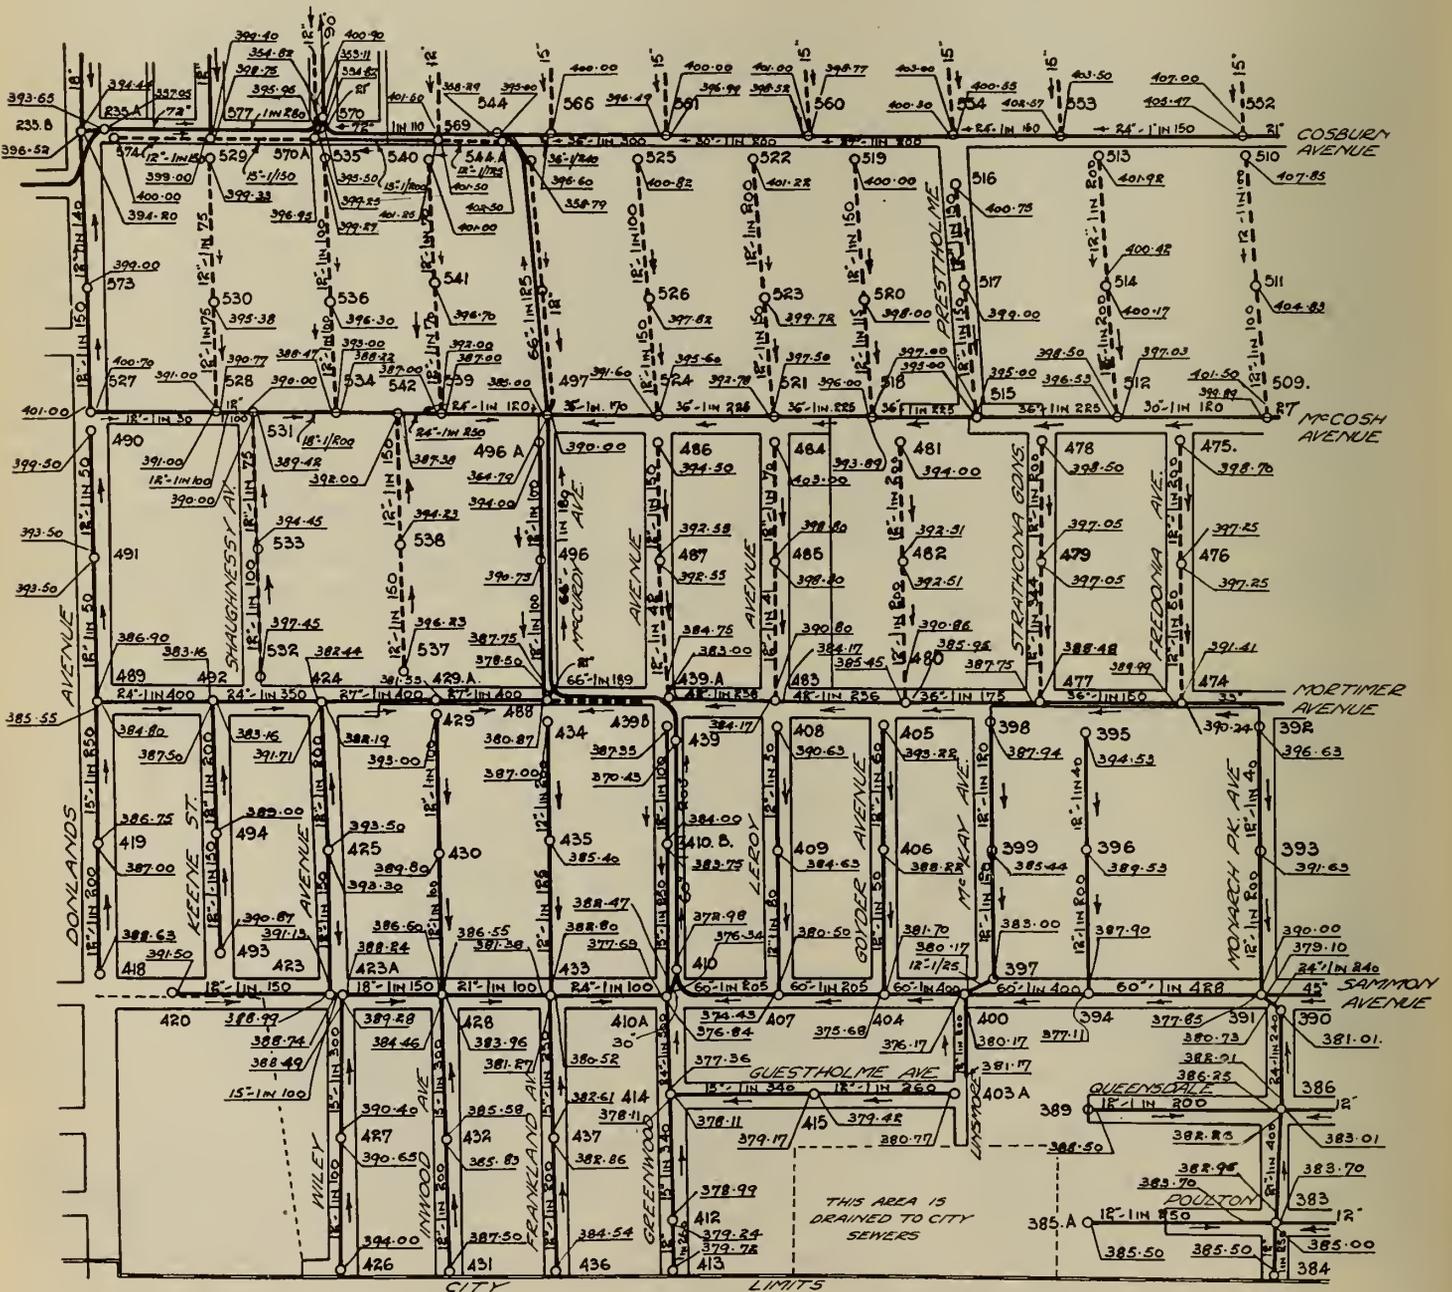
Portion of Key Plan of Greenwood Area.
